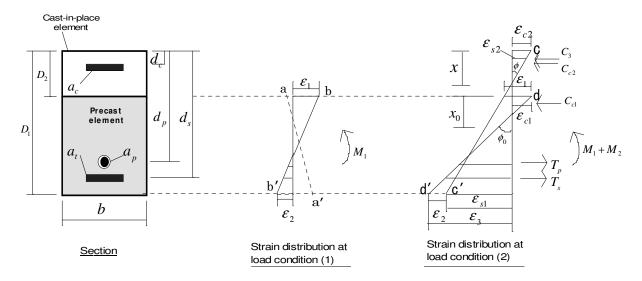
Section analysis mechanism for half-precast (partially prestressed) concrete composite beam
